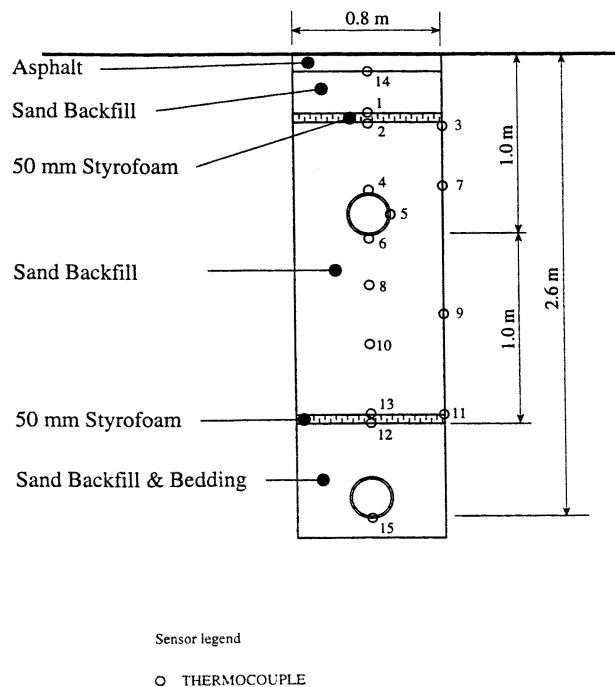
Backfill materials and sensor locations for test section F with Thermal Crete
